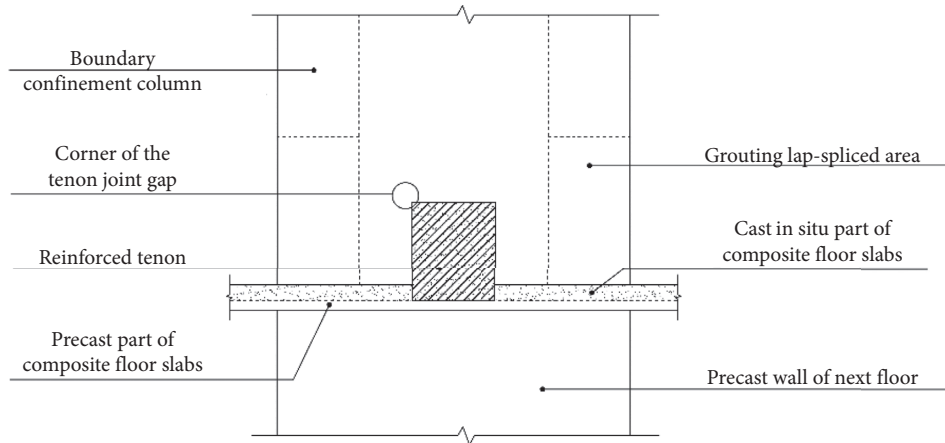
Construction of precast shear wall with the proposed reinforced tenon.
